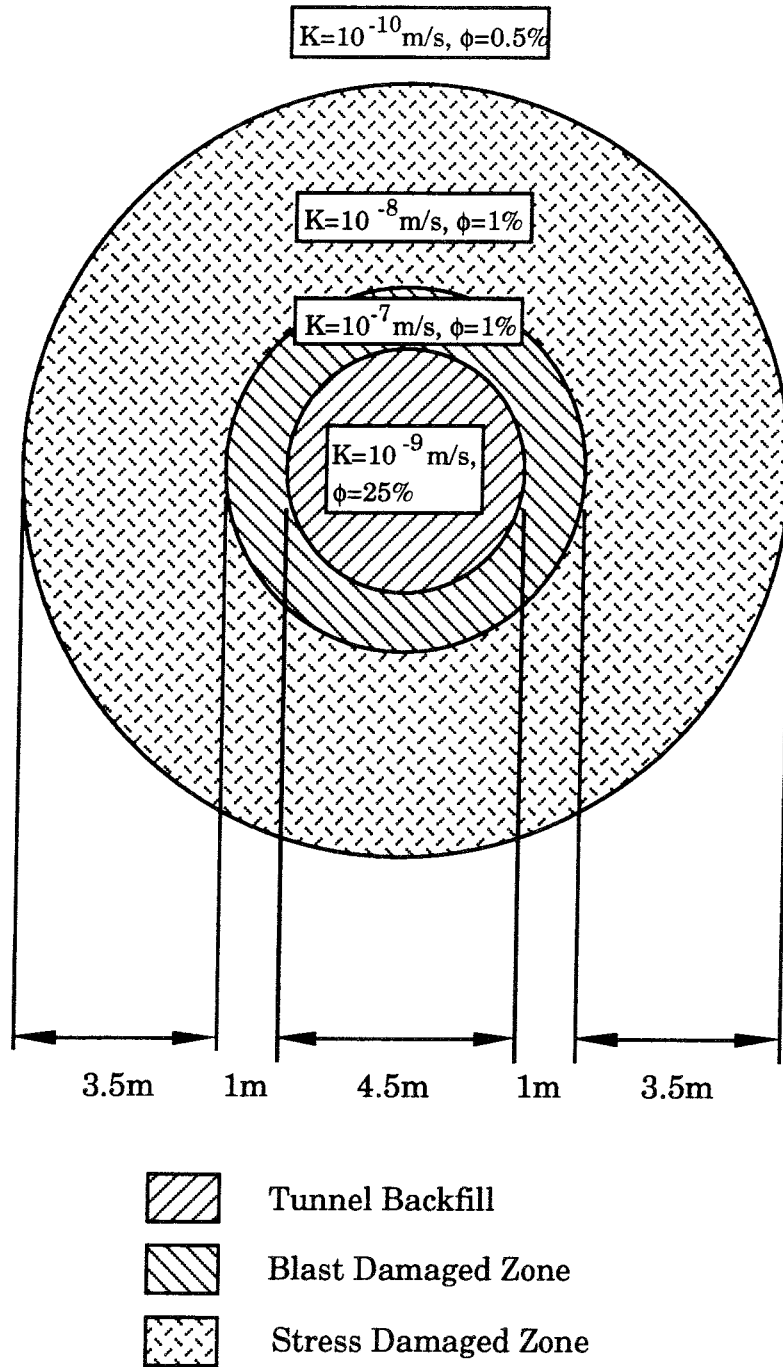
Schematic cross section of the KBS-3 tunnel and damaged zones (hydraulic conductivities, K , correspond to the conservative case—see subsection 3.3).
